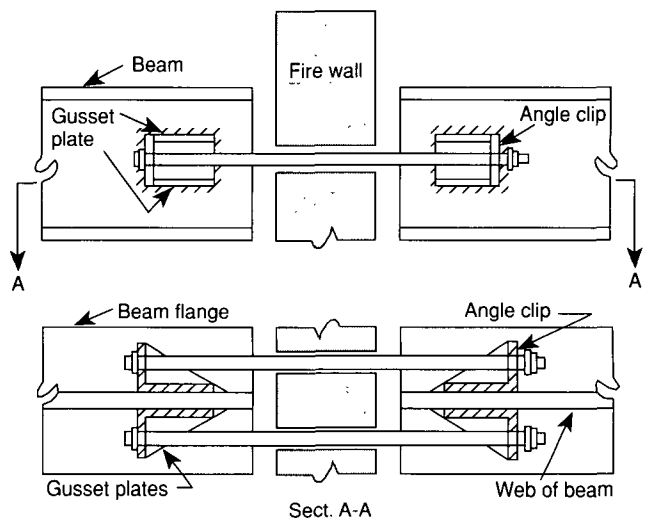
(f) Through-wall tie — primary roof framing perpendicular to wall.
